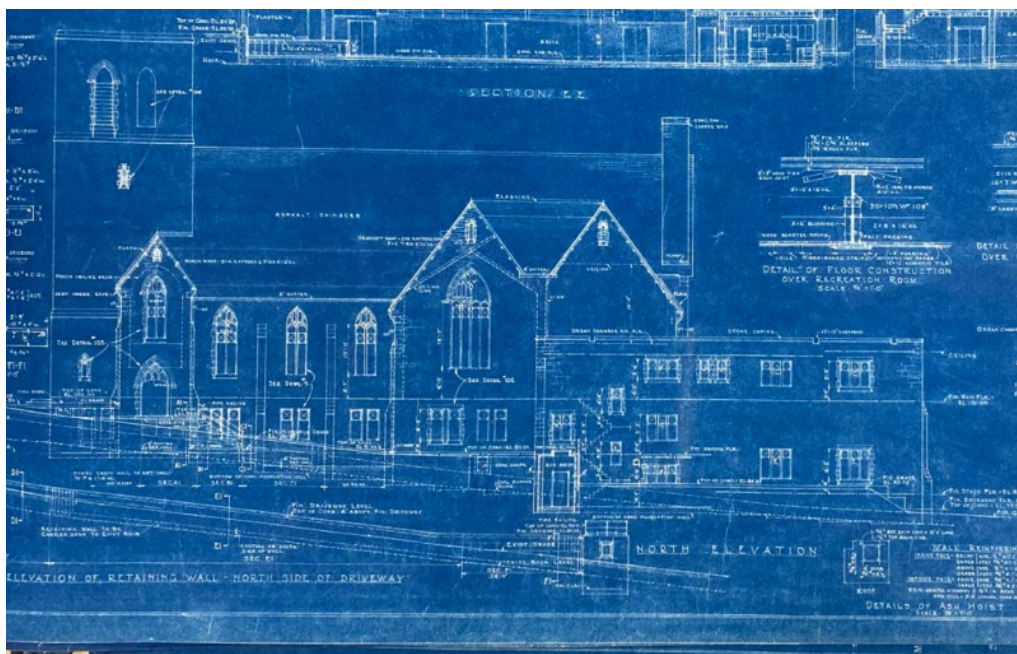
North elevation drawing, Bruce Brown & Brisley, 1948-1949<sup>7</sup>
